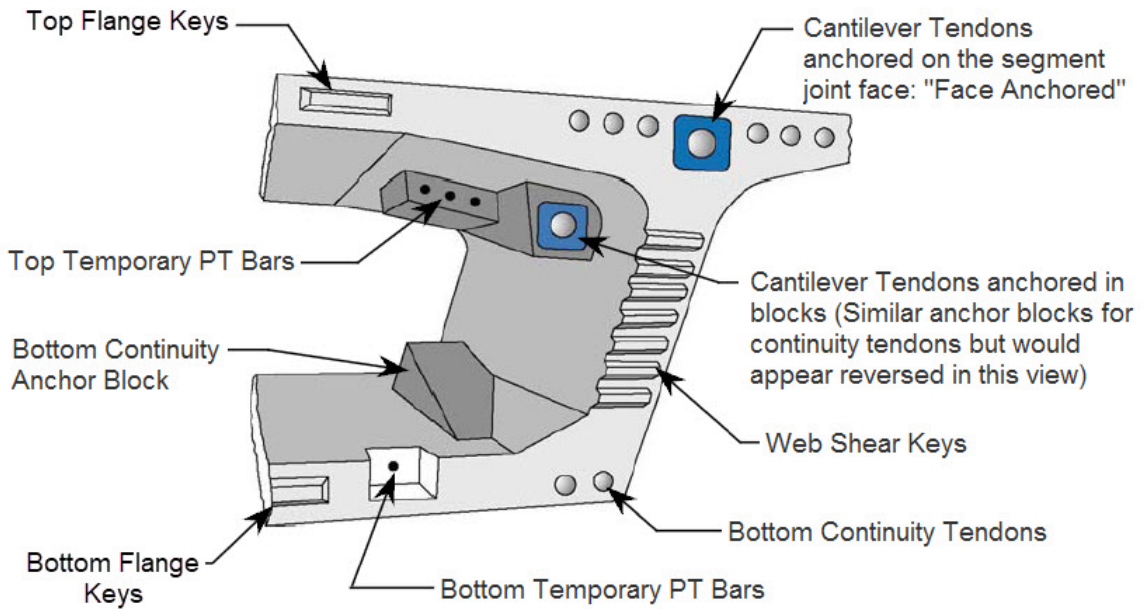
Typical Features of Precast Cantilever Box Girder Segments
